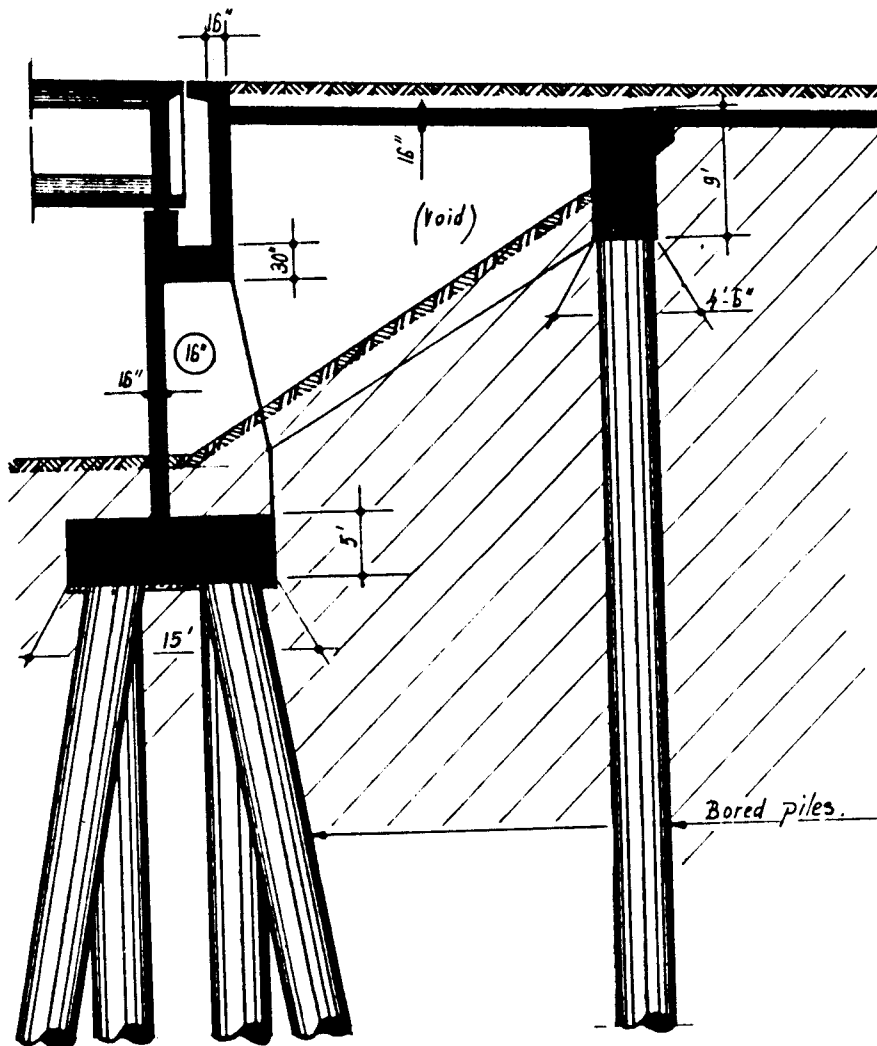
Hollow box abutment Type III, segmental bridges.
